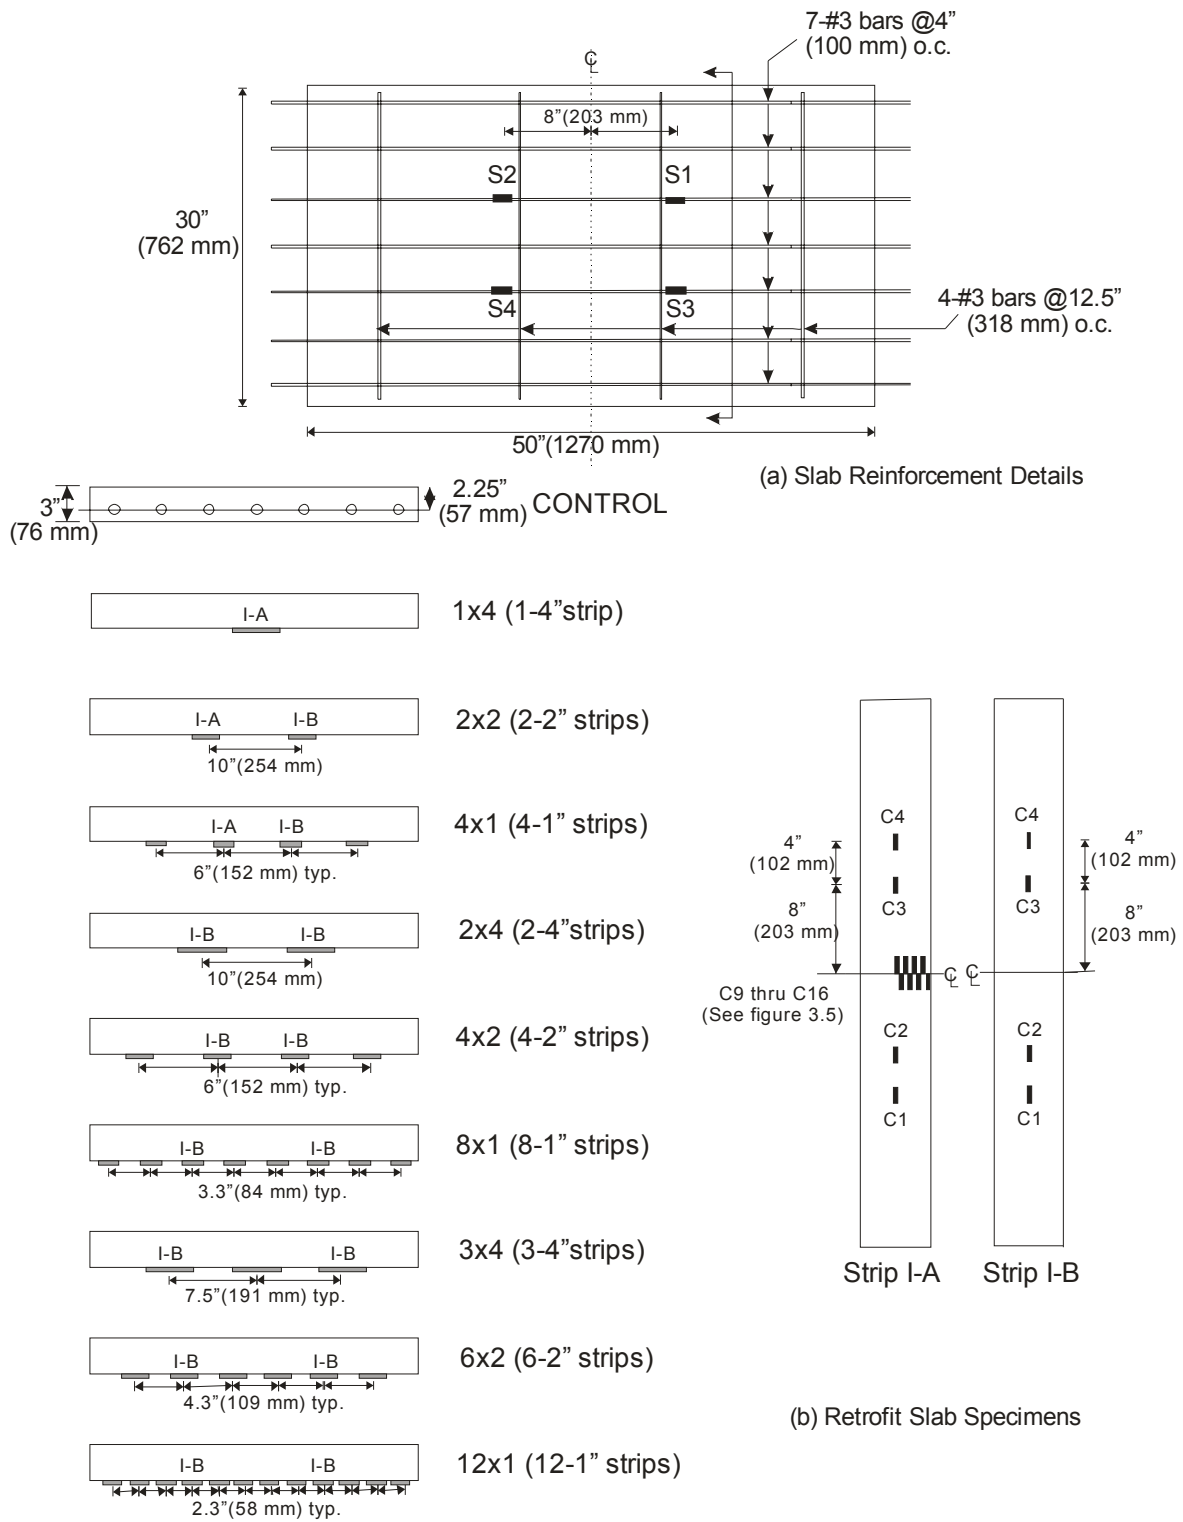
Details of slab reinforcement and retrofitted slab specimens.
